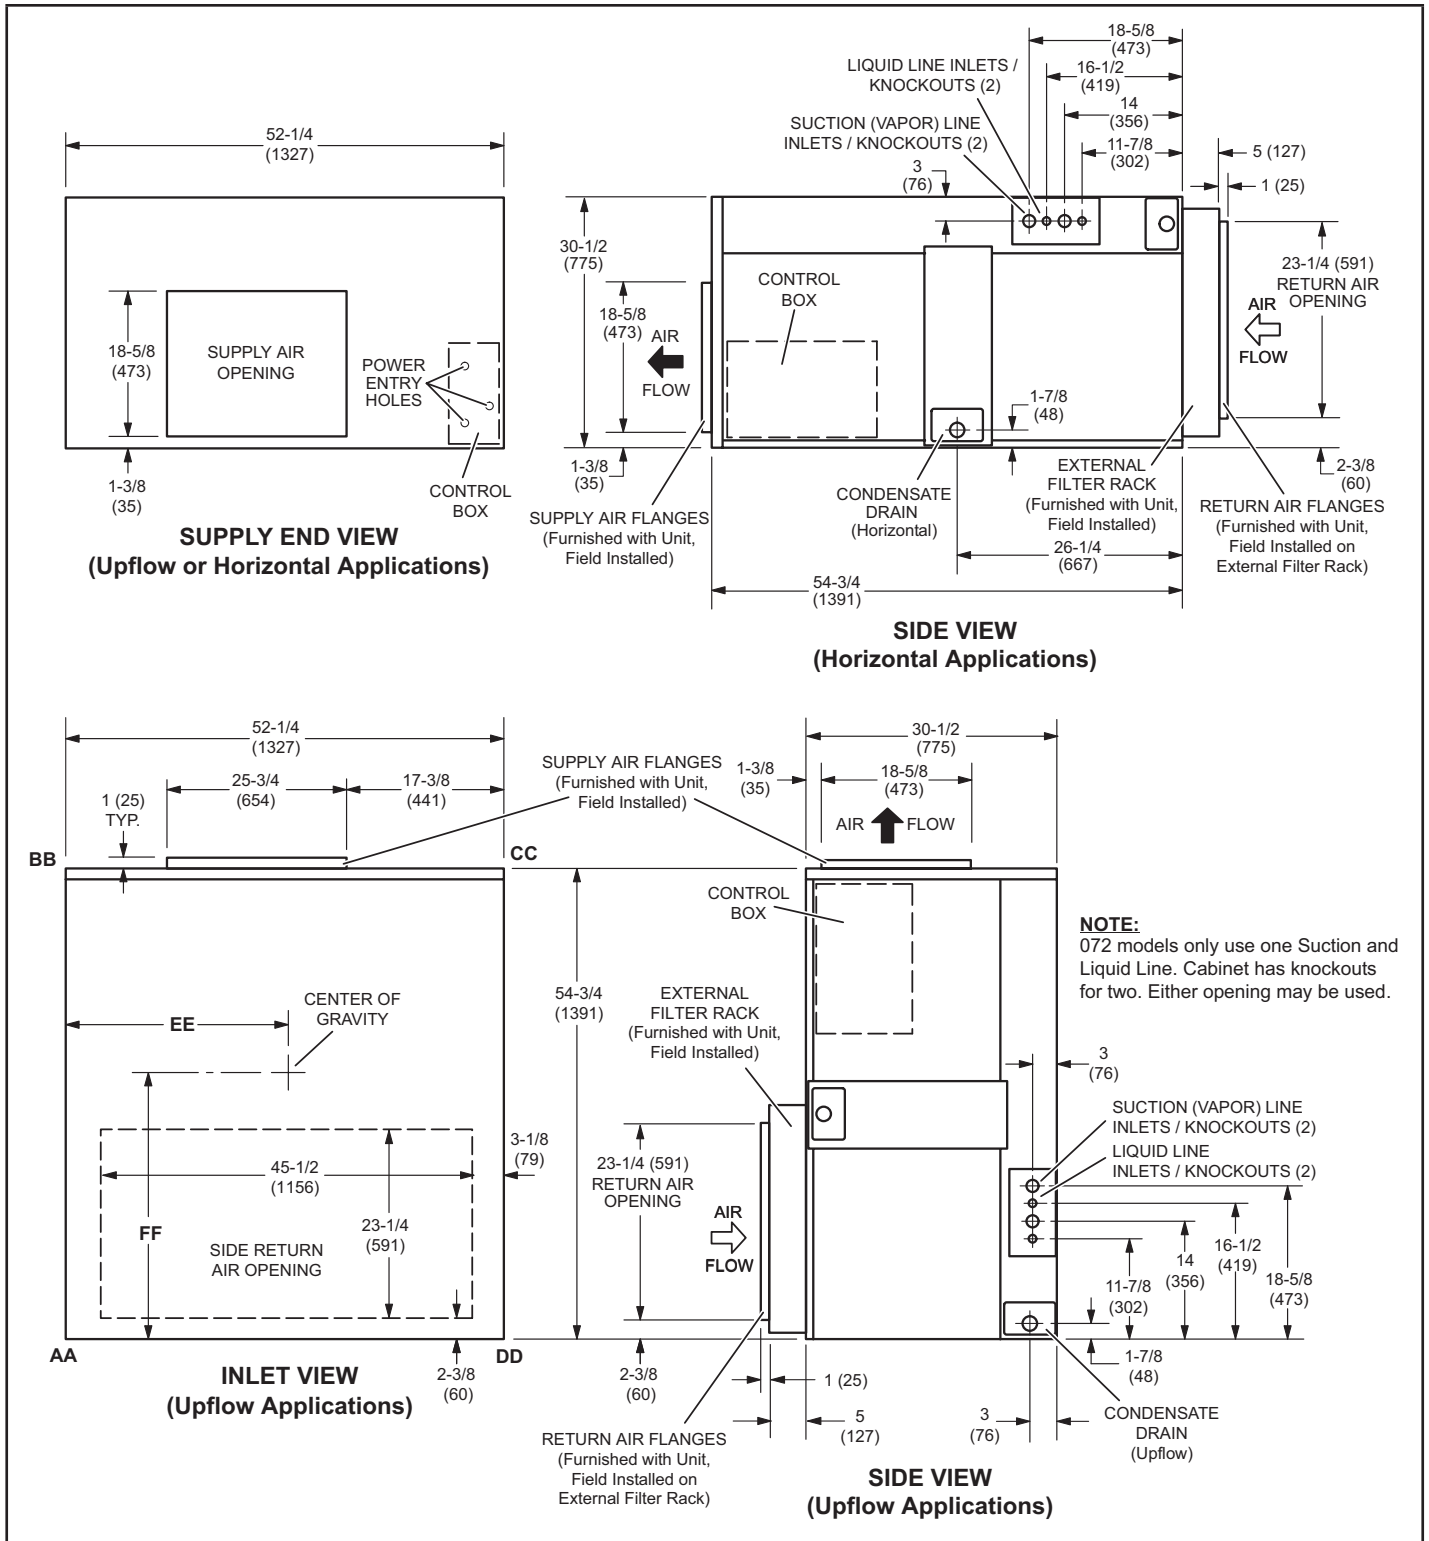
ELA 072-090 Unit Dimensions – inches (mm)
